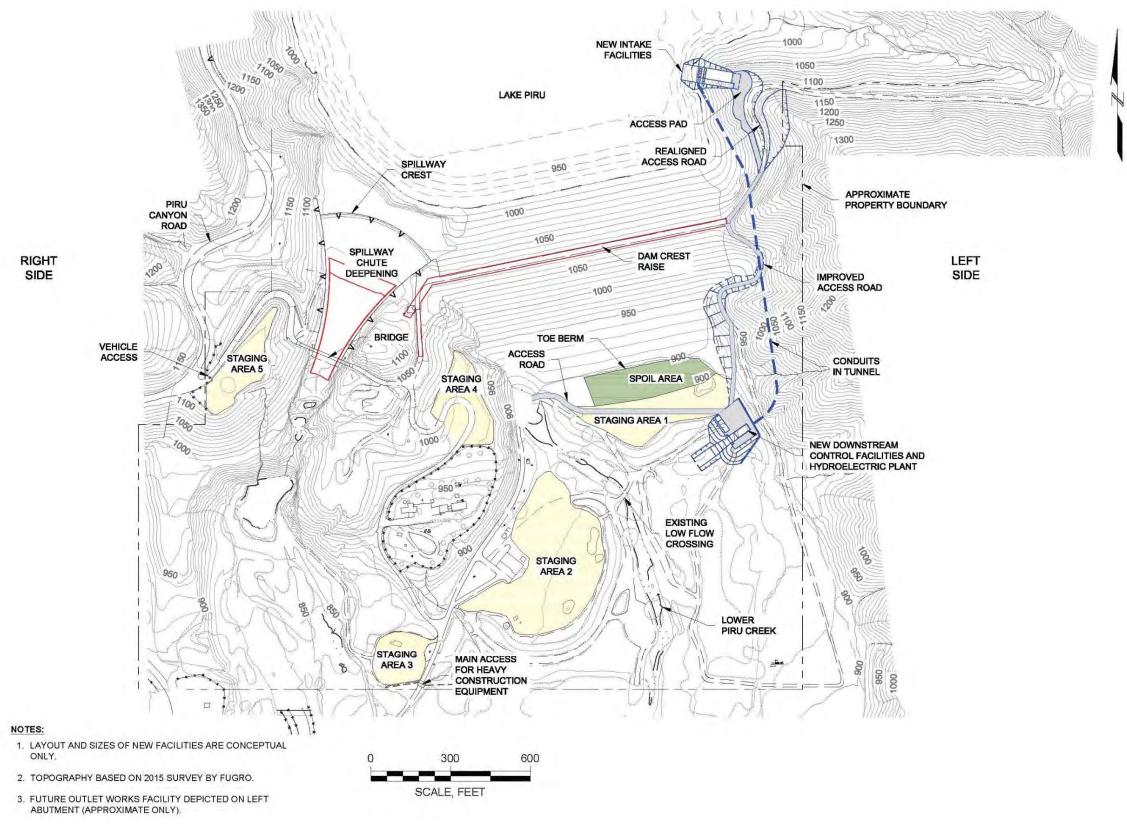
Spillway Deepening Option Layout and Construction Footprint
